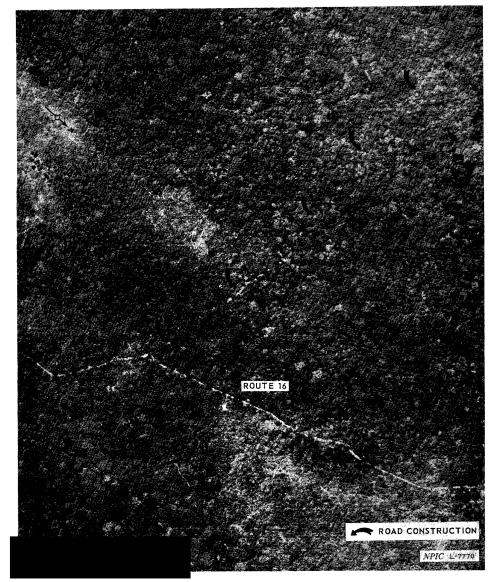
ROAD CONSTRUCTION, ROUTES 16 AND 110 AREA, LAOS
